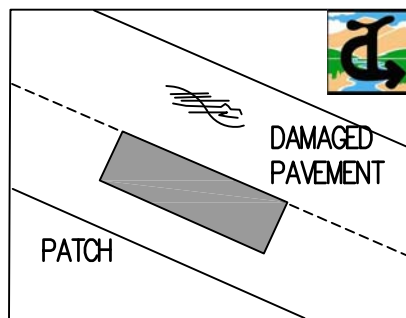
Example 11. Patch slope and grade must match existing pavement.
